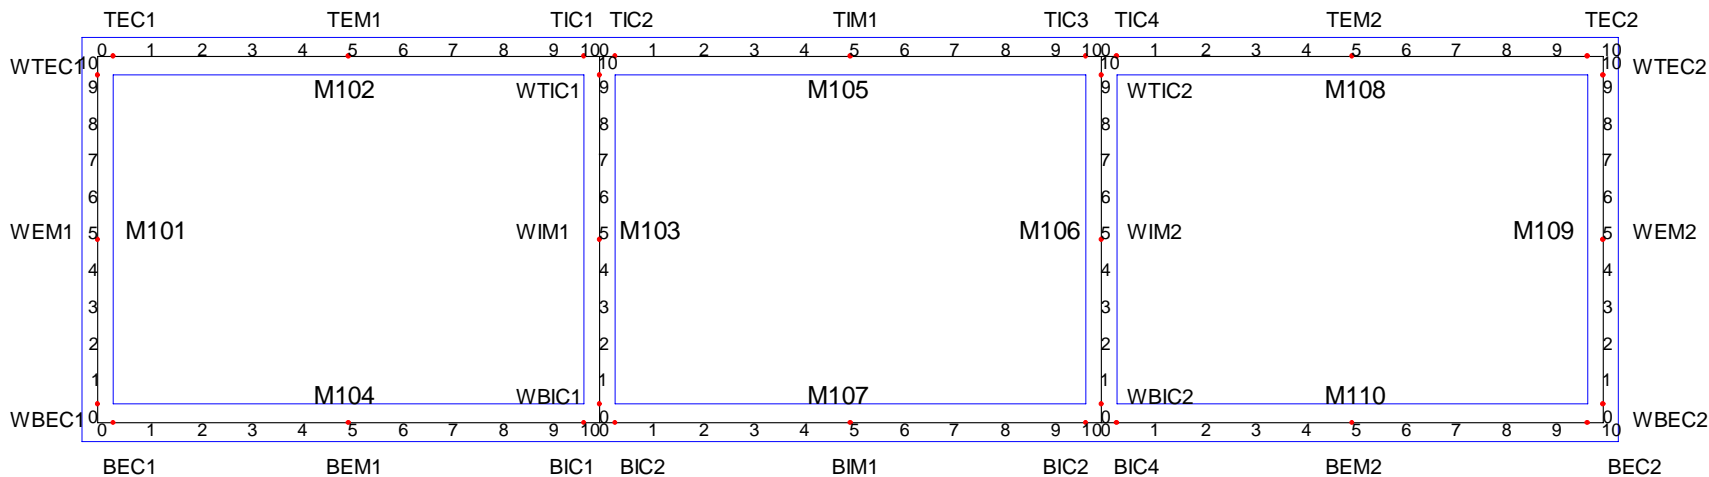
CROSS-SECTION SKETCH OF THE EXAMPLE CULVERT FOR THE ANALYTICAL MODEL.
